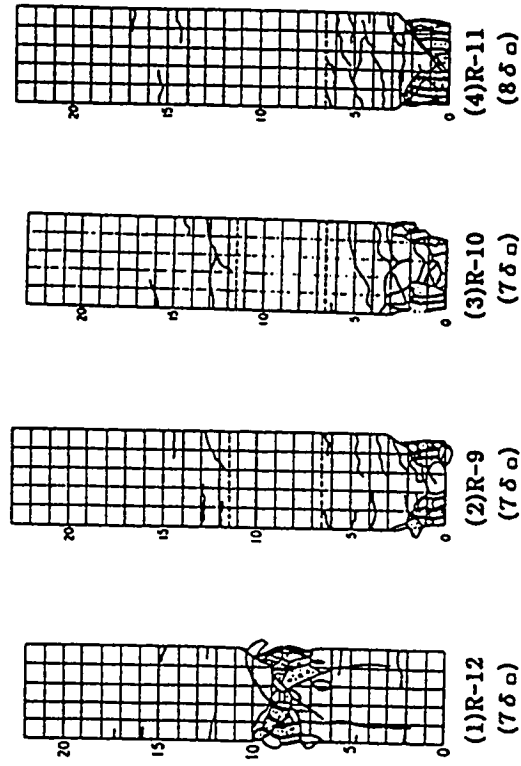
Shear Strengthening of Square Columns by the Use of Steel Jackets, Crack Pattern of the test Columns, Ref. [24].
